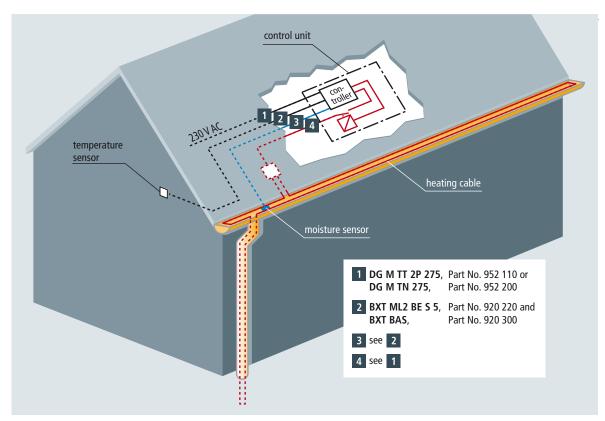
Control unit connected to surge arresters in a structure without external lightning protection system
